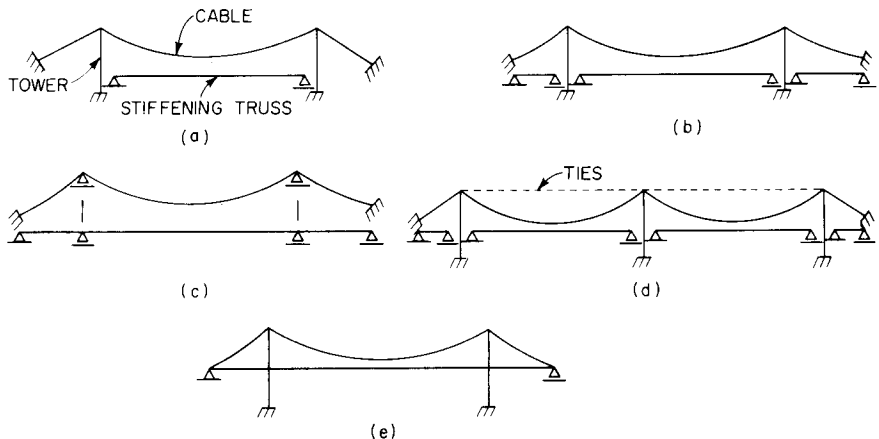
Suspension-bridge arrangements. (a) One suspended span, with pin-ended stiffening truss. (b) Three suspended spans, with pin-ended stiffening trusses. (c) Three suspended spans, with continuous stiffening truss. (d) Multispan bridge, with pin-ended stiffening trusses. (e) Self-anchored suspension bridge.
